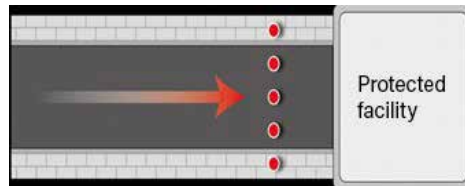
Fixed bollards in the carriageway zone and the pedestrian route zone.
